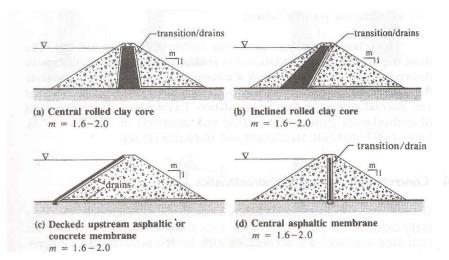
Principal variants of rock fill embankments dams (values of m are examples)
